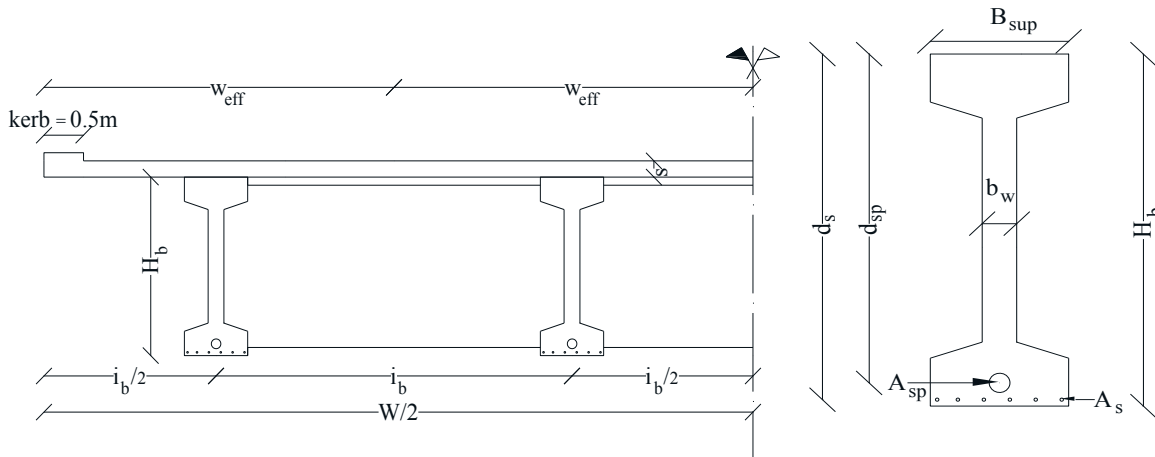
Cross sections of the bridge deck and longitudinal girder.
